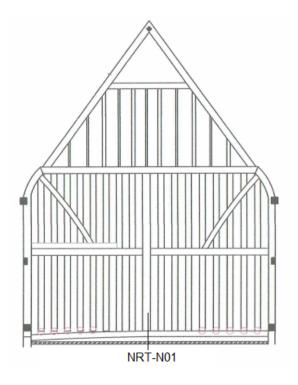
South gable wall (interior elevation), showing the location of sample NRT-N01 (after Tim Buxbaum Architect 2016 Drawing No 907/7)
